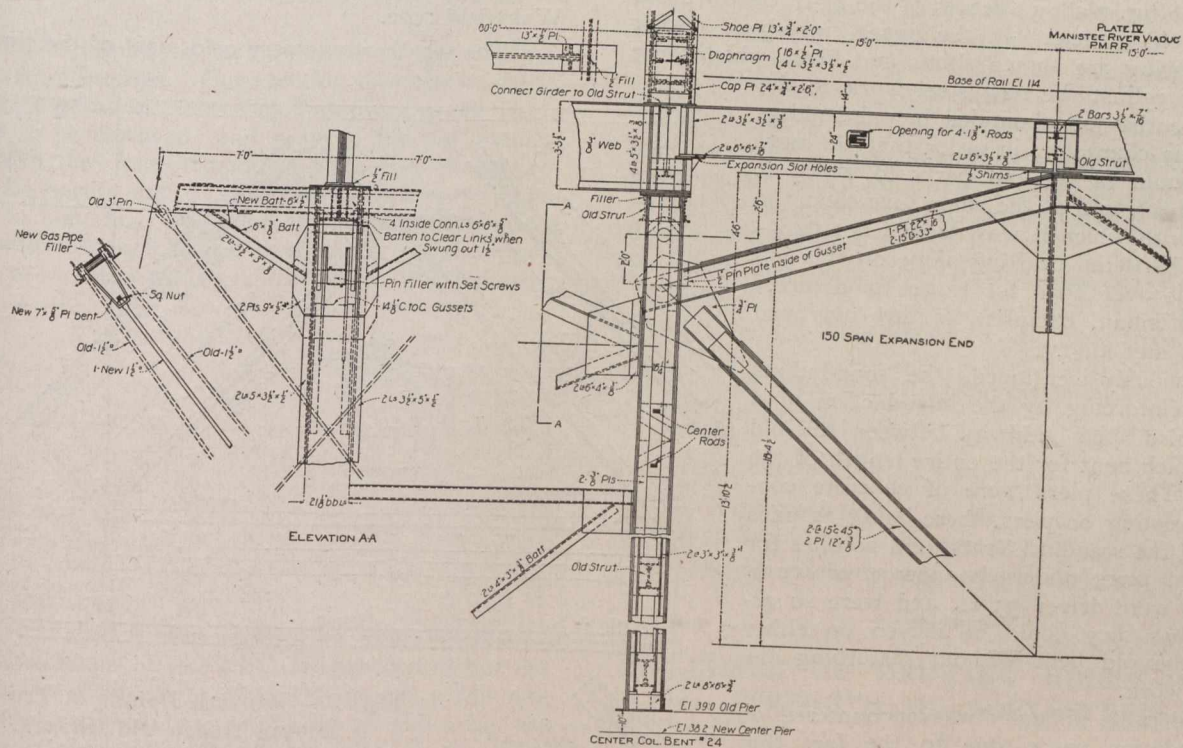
Provision for Expansion in Centre River Truss by Link Construction.
